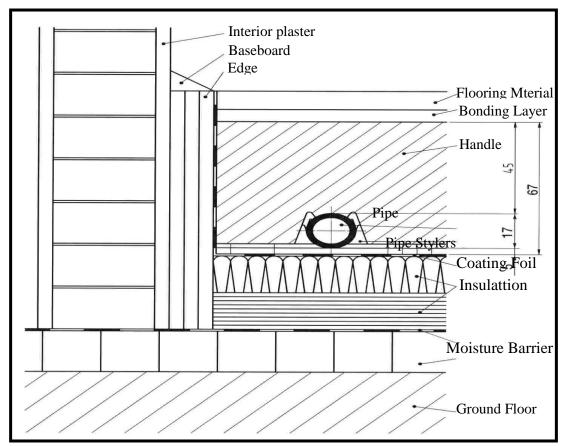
Underfloor Heating System Application Section (TMD, 2009)
